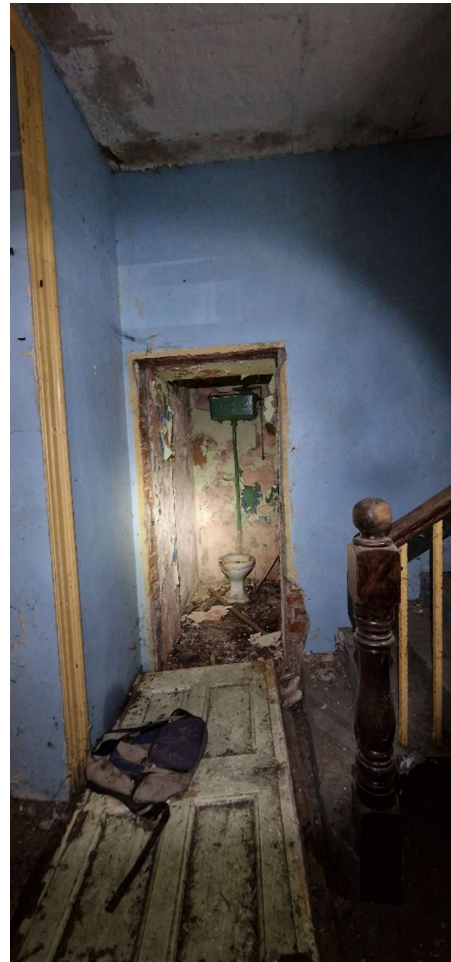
Bathroom outshot (GF-1) door fallen into stairwell, north wing
